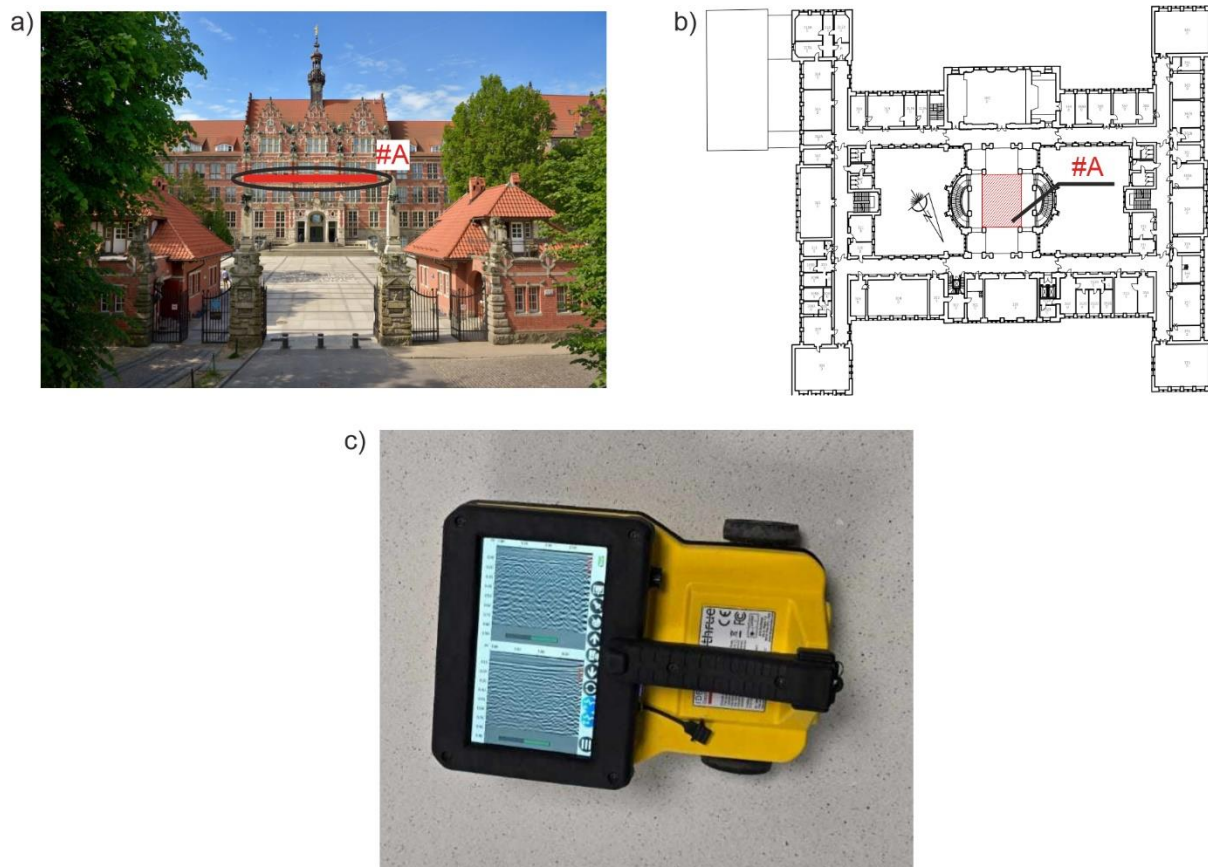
Measurement area #A: a) location of the ceiling, b) marking on the 3. floor plan, c) ground penetrating radar used in measurements.
